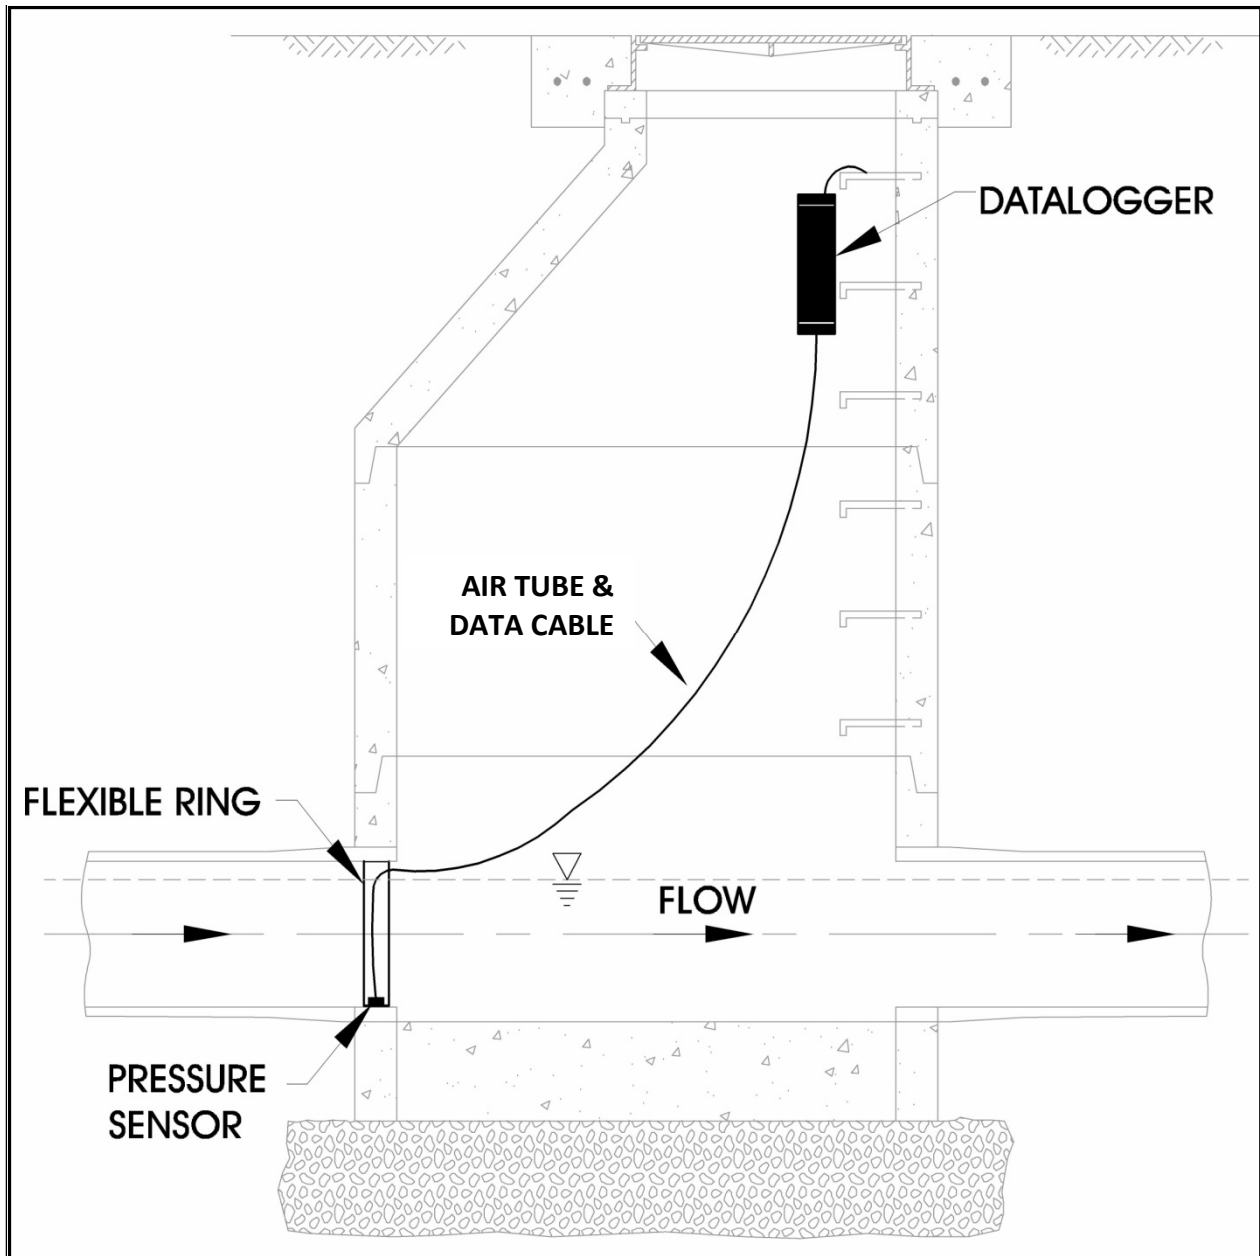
TYPICAL SIGMA 910 FLOW METER INSTALLATION
